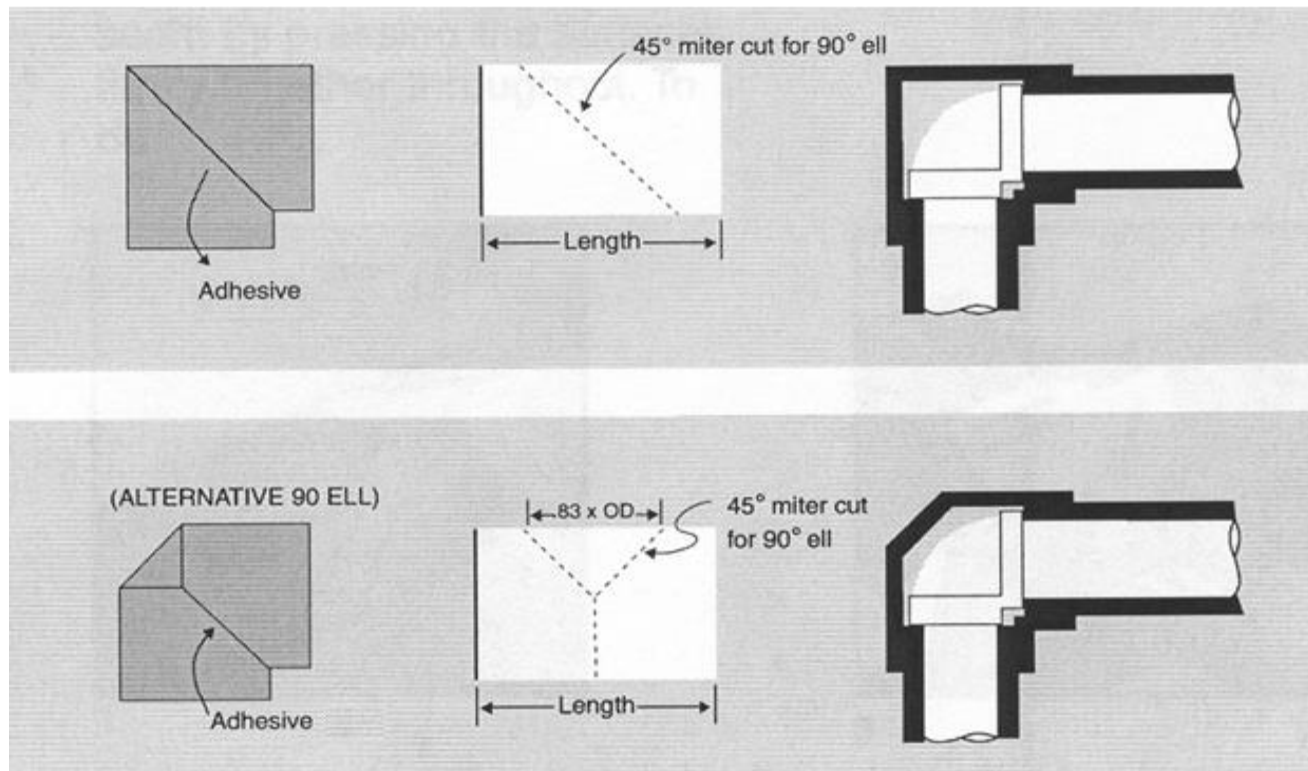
90-degree elbow installation with tubular form insulation on 5-inch IPS piping and below.
